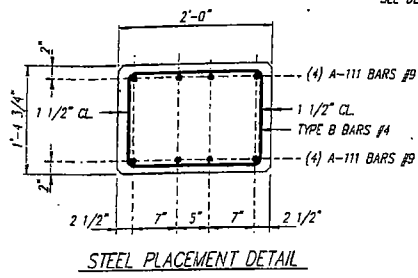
Pile Connections by Anchor Plates to Precast Concrete Bent Cap
